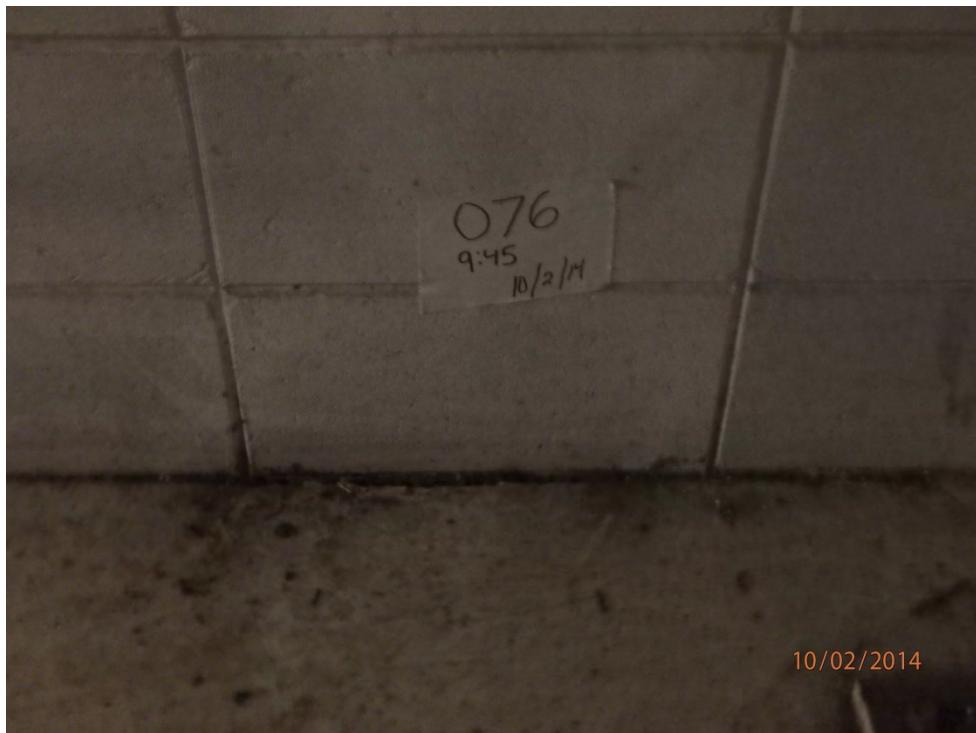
Sample 076 fibrous caulk bottom of east wall near Column F1
